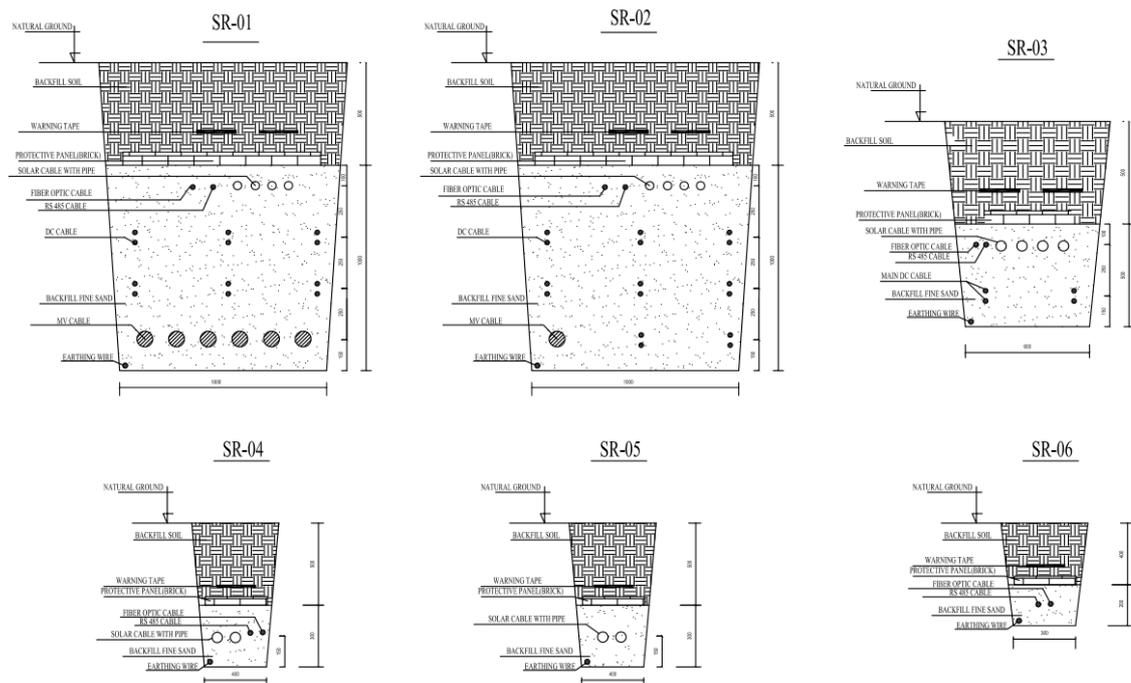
Cable layout in trenches. Reprinted from Zhongnan Engineering [15]
